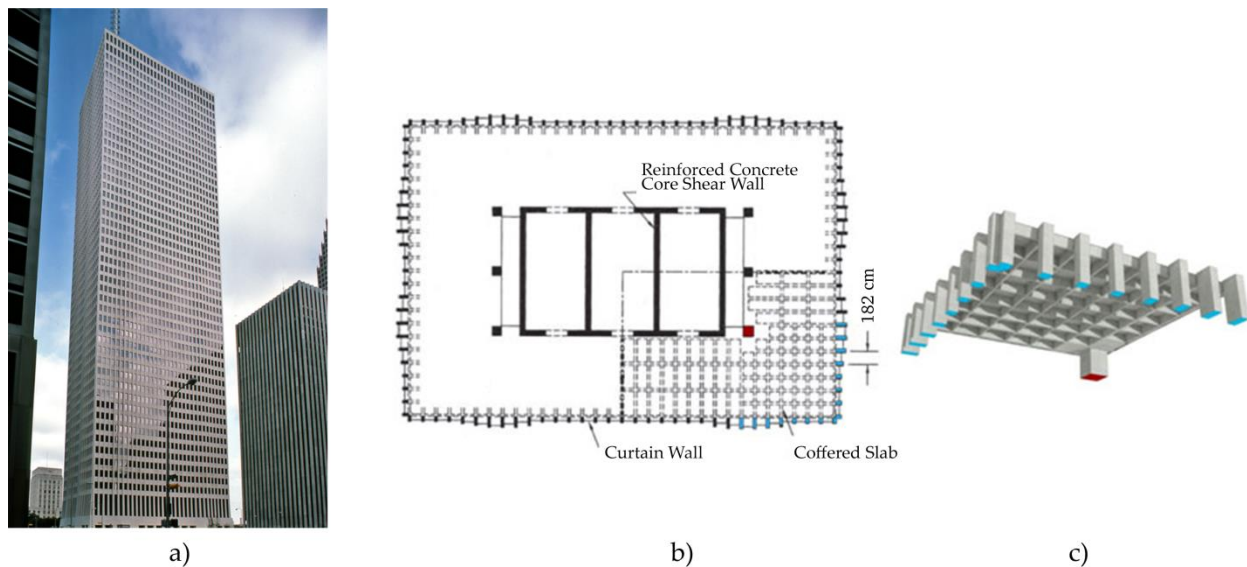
a) One Shell Plaza [30] b) Plan [31] c) Modeled coffered slab [31]
